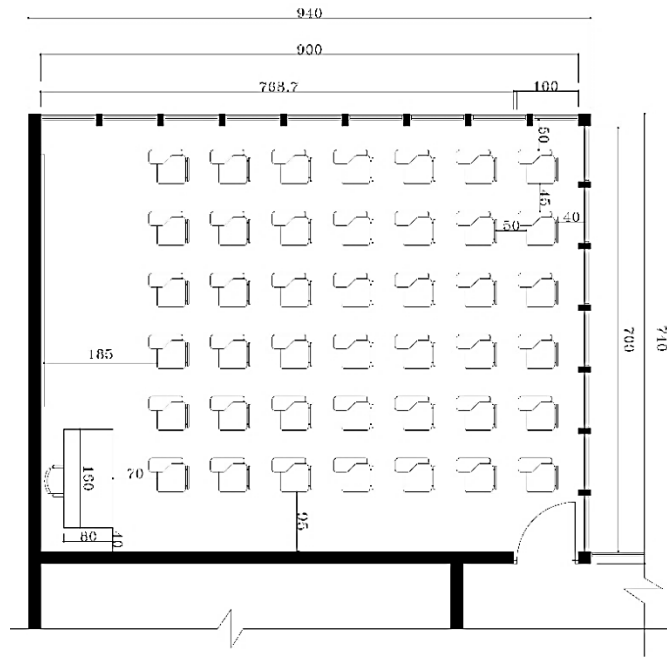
Classrooms Type-B Interior Furniture Arrangement in the Techno Park Building
